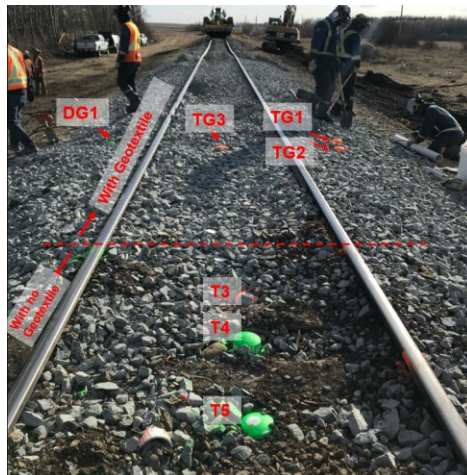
Site after installation of access pipes (Alvarenga et al. 2020).
